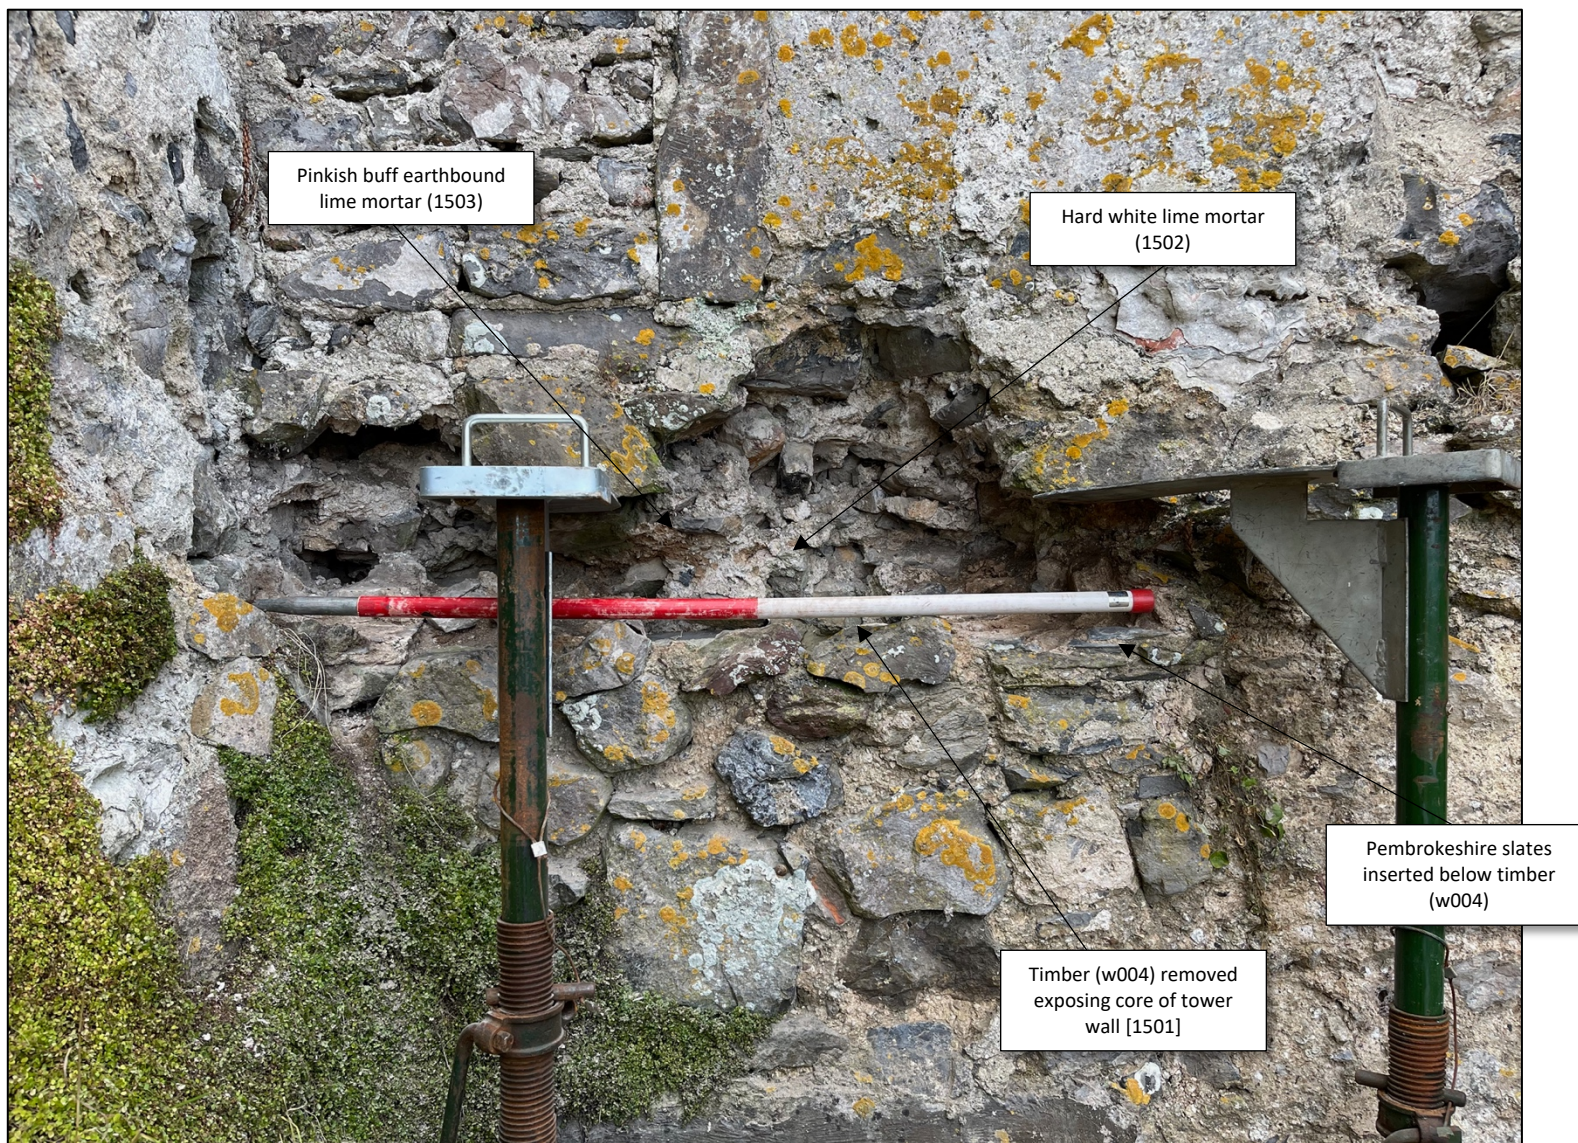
Location 15 Medieval Tower/19<sup>th</sup> Century Kitchen, view of NE facing wall core.
